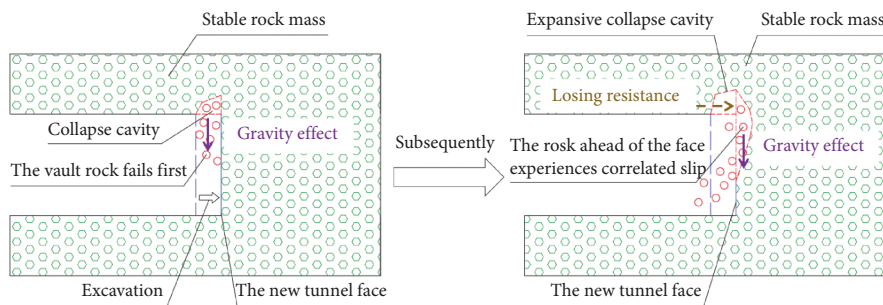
The instability mechanism of the tunnel face after tunnel excavation.
